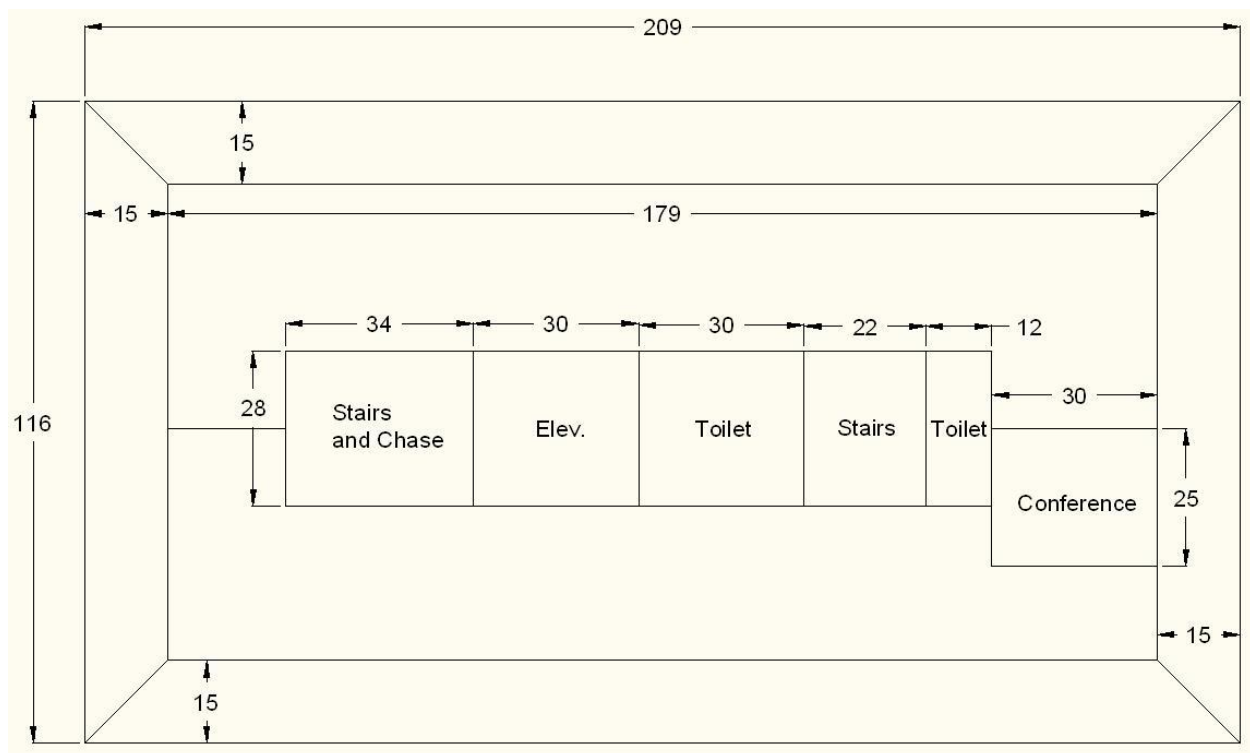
Tenant floor plan of core and perimeter zones (Case Study III).
